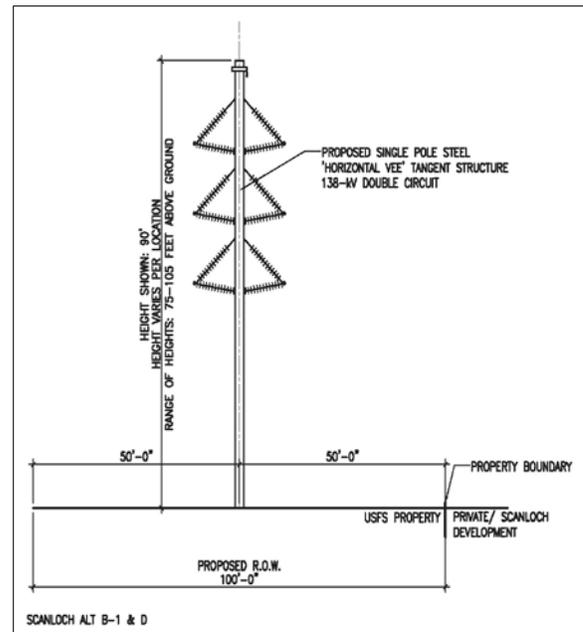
Typical Single-Pole Steel Structure Profile.
